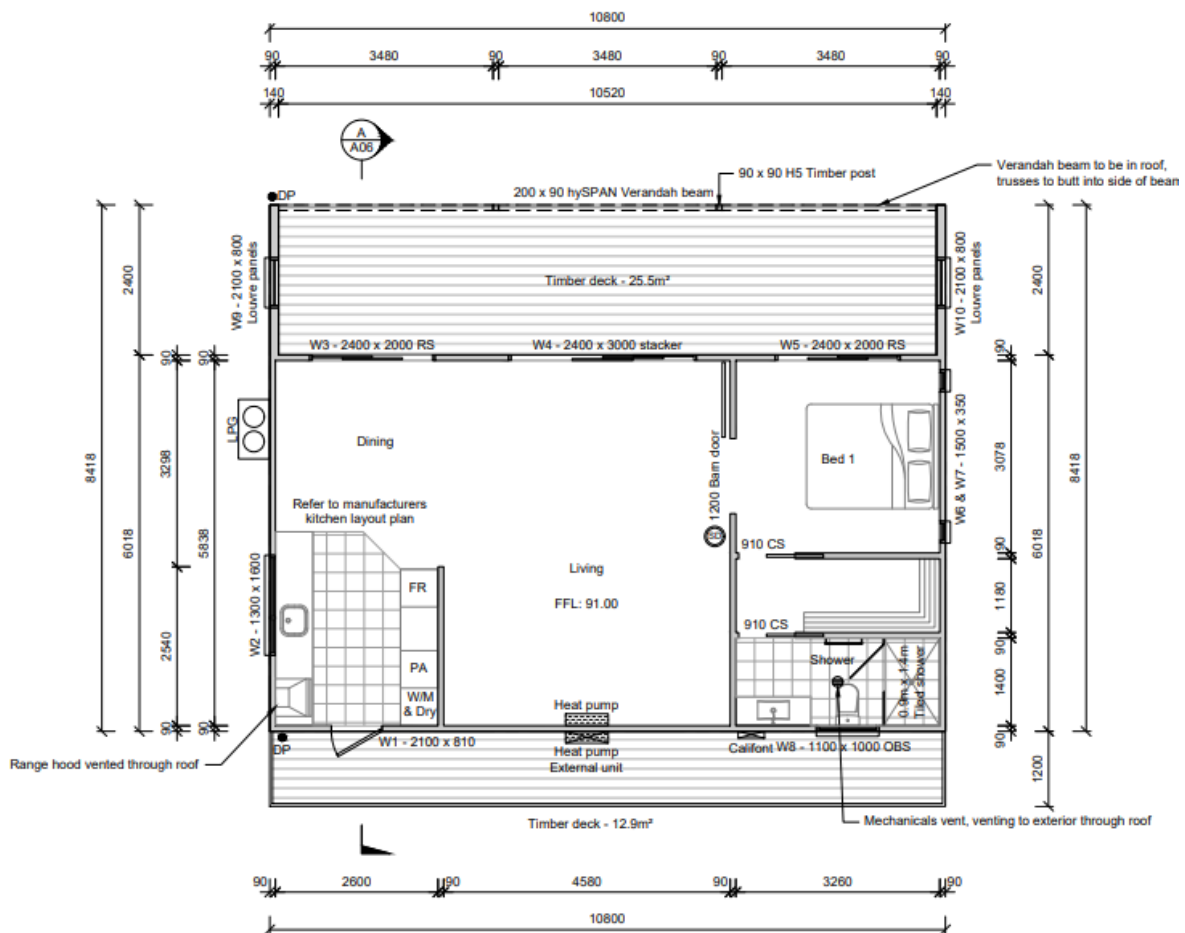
Proposed floor plan (Source: O’Brien Design Consulting)
